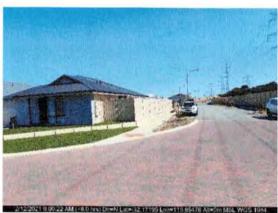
Looking at the developed neighbouring lots and road infrastructure.
